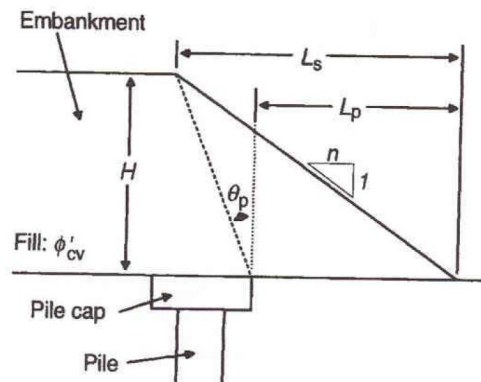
Lateral extent of piles under the embankment slope (BSI, 2010).
